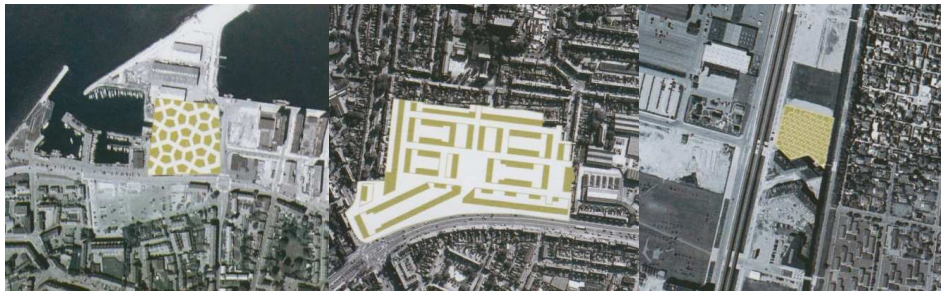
Plans of designed modern architectural complexes within an existing building:
